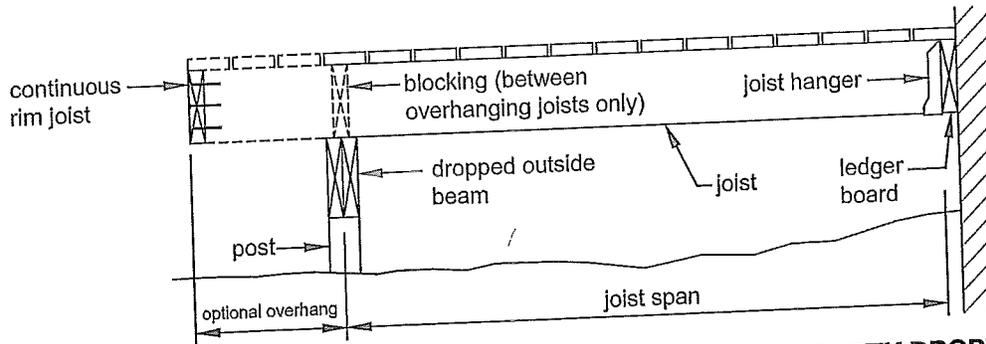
SINGLE SPAN DECK - JOISTS ATTACHED AT HOUSE WITH DROPPED BEAM
